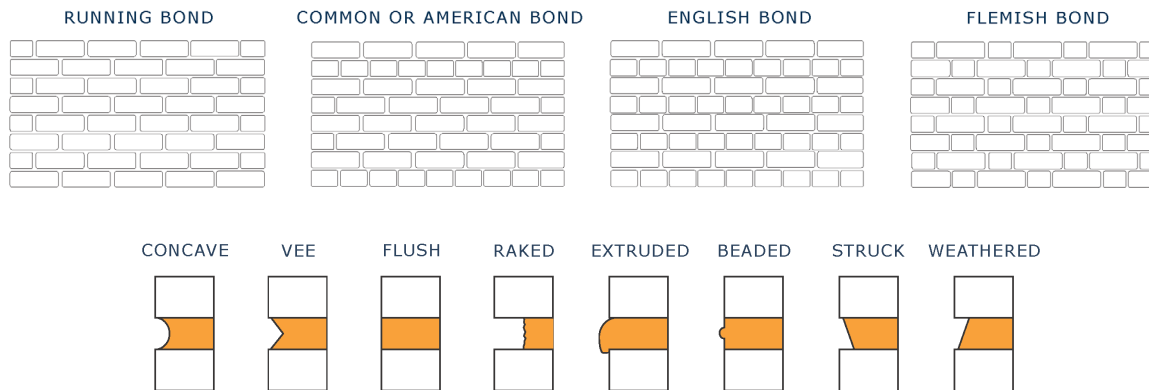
Examples of typical brick bond patterns and brick mortar joints.
